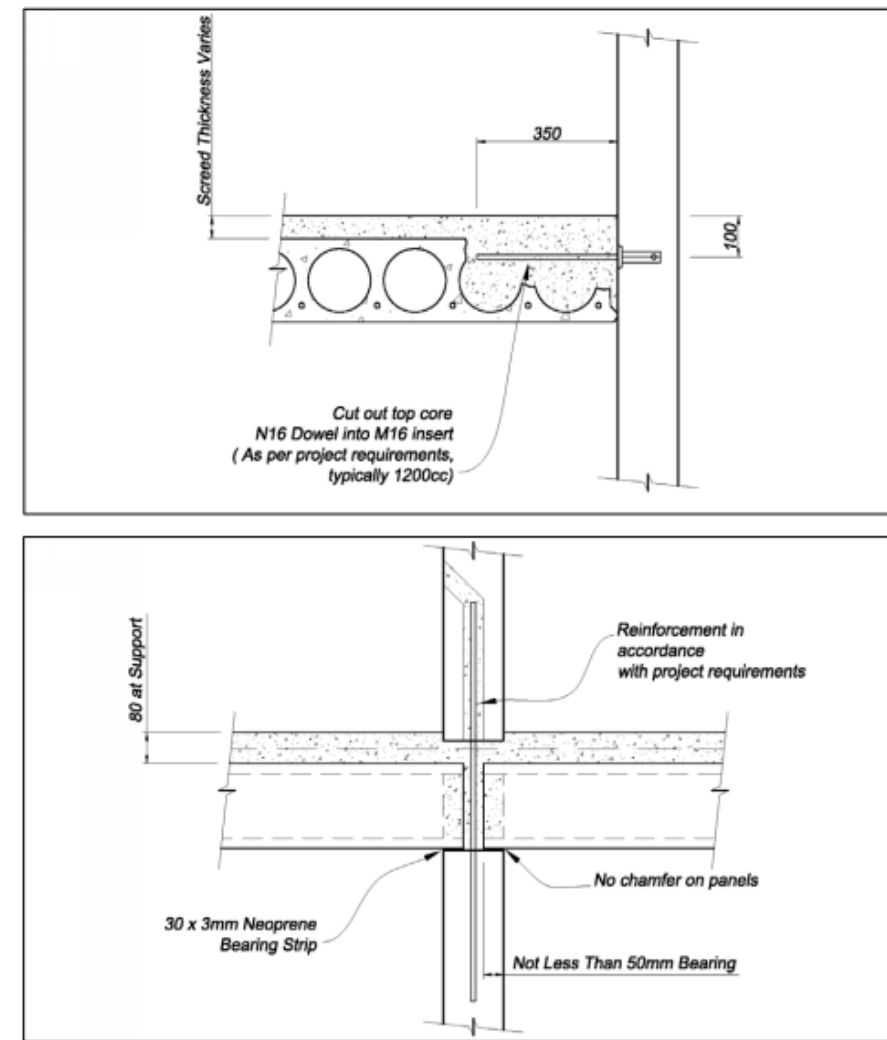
Hollowcore Floor to Wall Typical Details (Hollowcore Concrete Pty Ltd)
